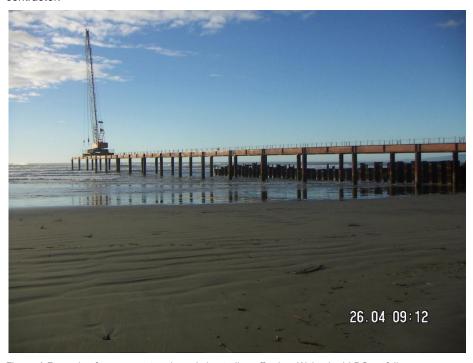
Example of temporary trestle and sheet pile cofferdam Waimakariri DC outfall
